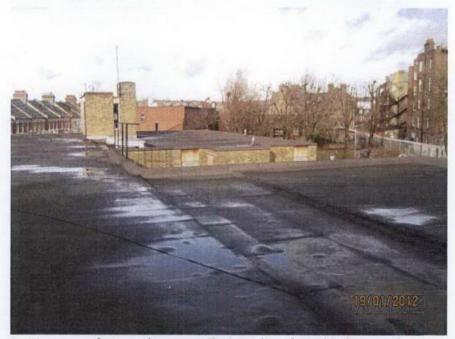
Upper roof area where ventilation plant from kitchen roof to be re-sited
